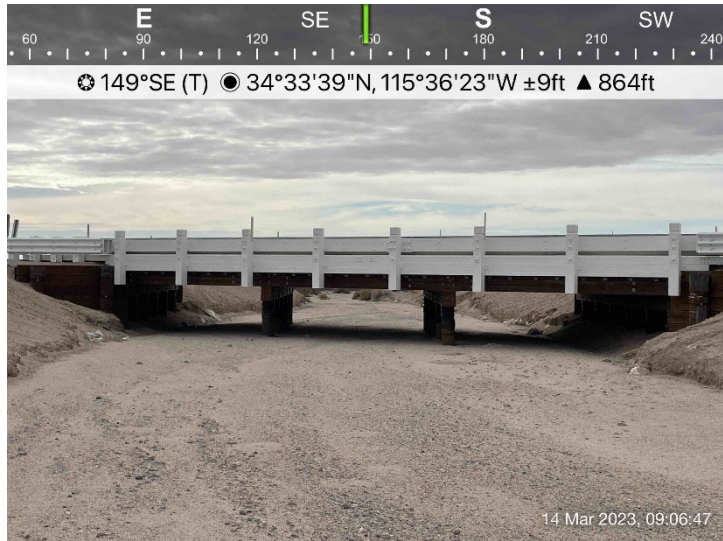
Downstream view of Dolan Ditch Bridge, facing south on March 14, 2023.
